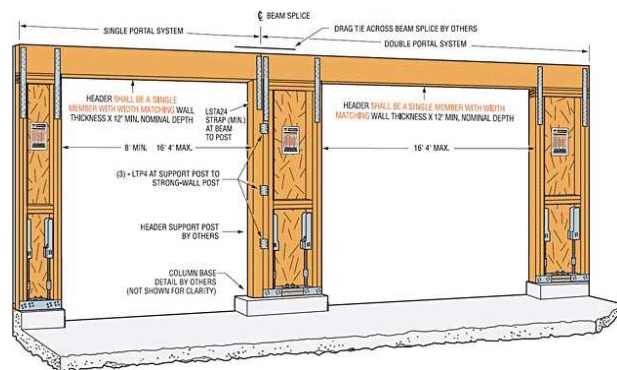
Advanced braced wall panel (Source: www.hardyframe.com & www.simpsonstrongwall.com)
